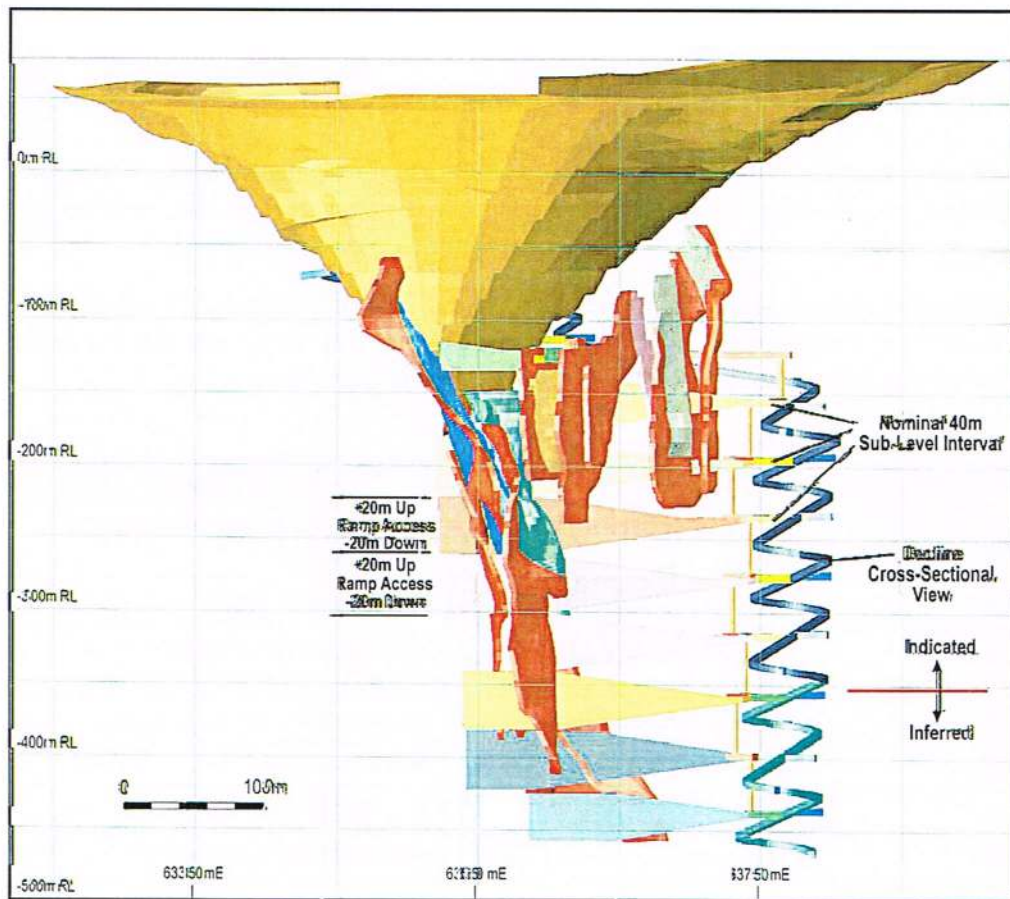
Open pit and underground mine design of the Siana Gold Project looking NNW (MCC).
